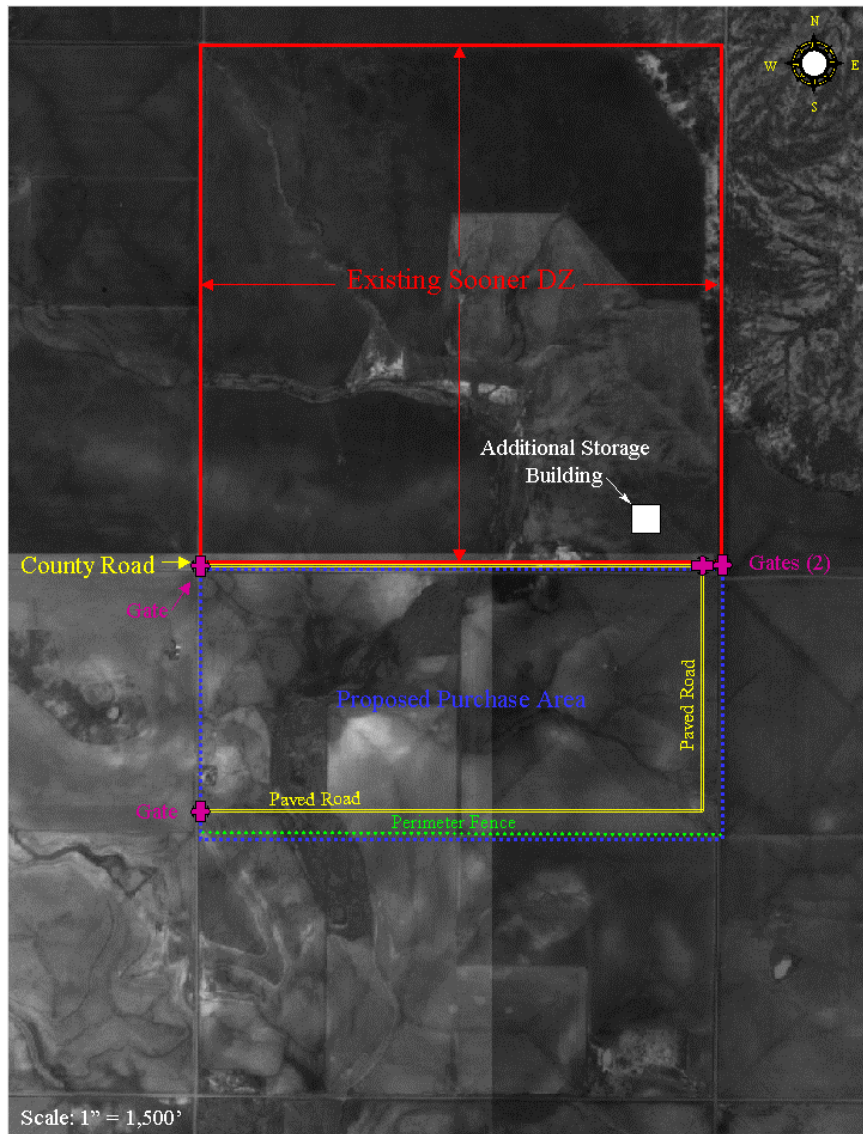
General Site Plan, Proposed Action, Altus Air Force Base, Oklahoma
